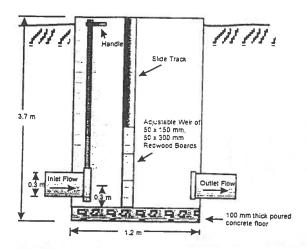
Schematic drawing of manhole and weir structure used on Broadview Shallow Ground Water Management Demonstration Project.
